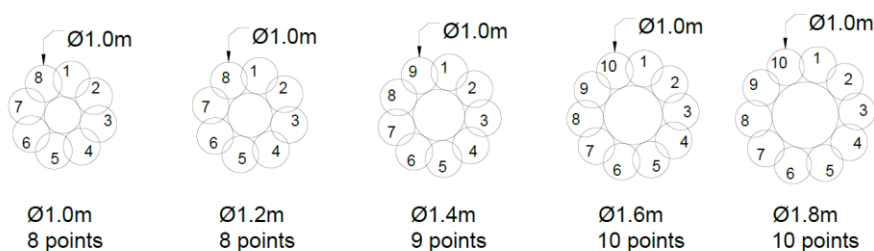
An example of the grouting layout by the multiple-point grouting method (for bored piles with a diameter ranging from 1.0 m to 1.8 m in the limestone cavity or slump zone)
